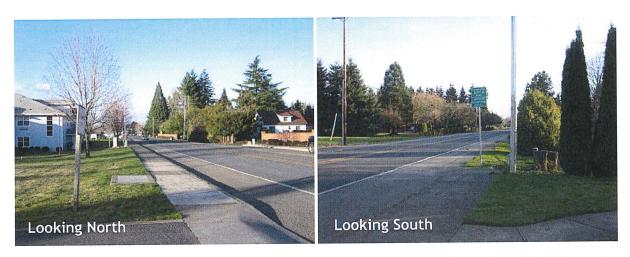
Intersection Sight Distance (Looking North and South from Existing Hope Village Access)
